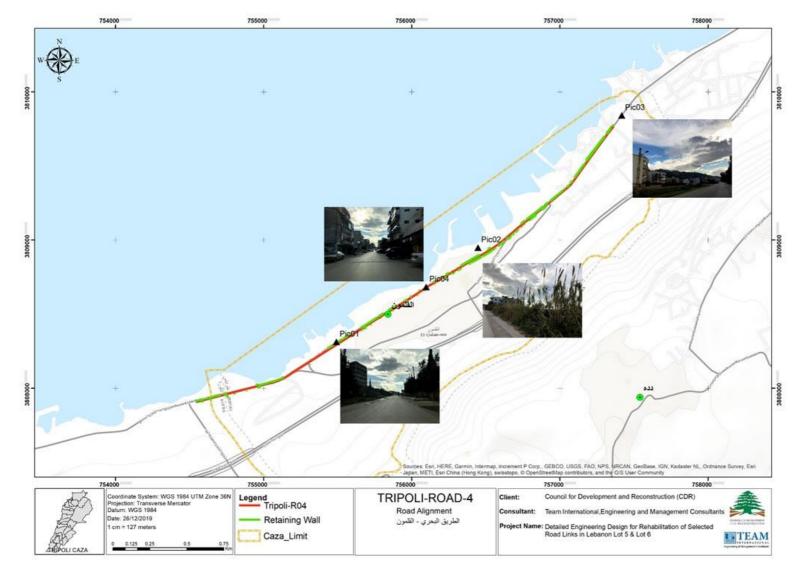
Road alignment of Tripoli Road 4 (Qalamoun Seaside Road) with contour elevations
